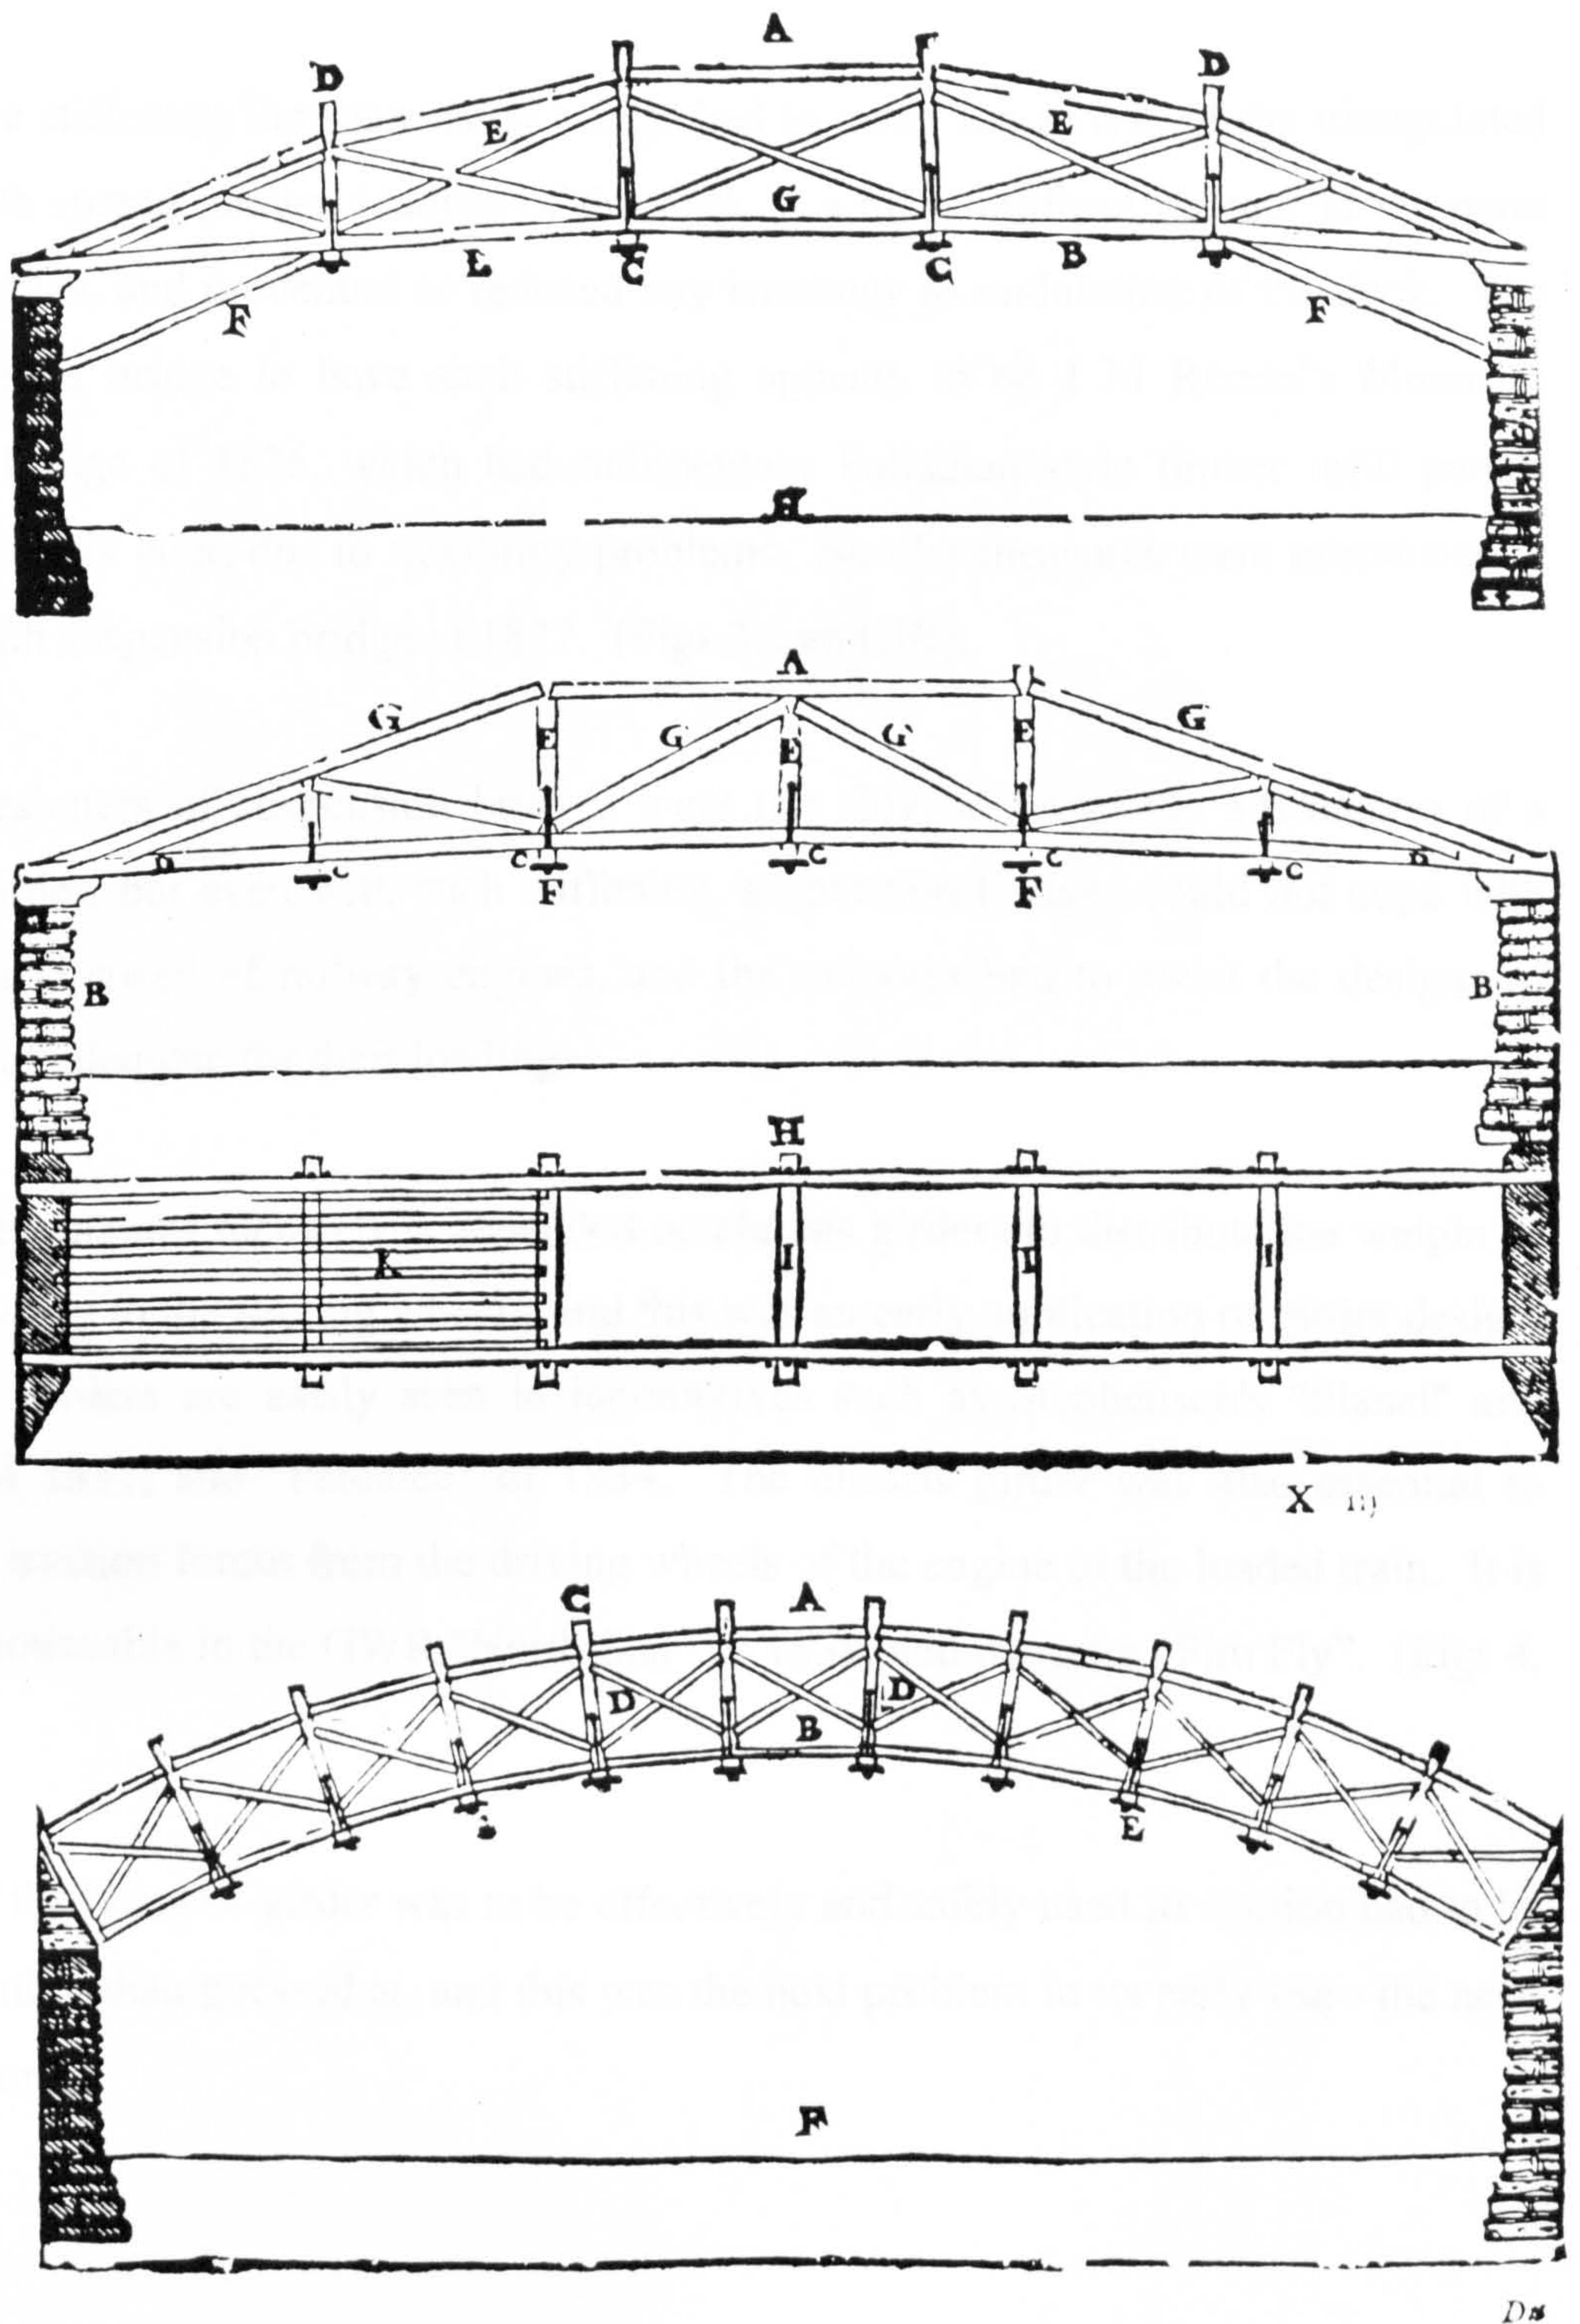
Typical trusses of Andrea Palladio. (Hopkins, 1970)
